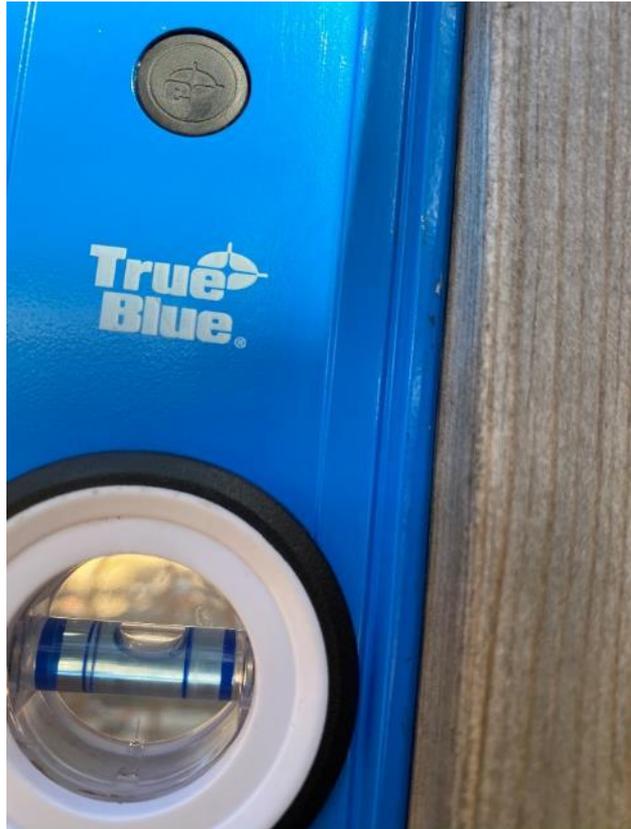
The timber wall frame is not straight and has deflected 2mm from the vertical.
